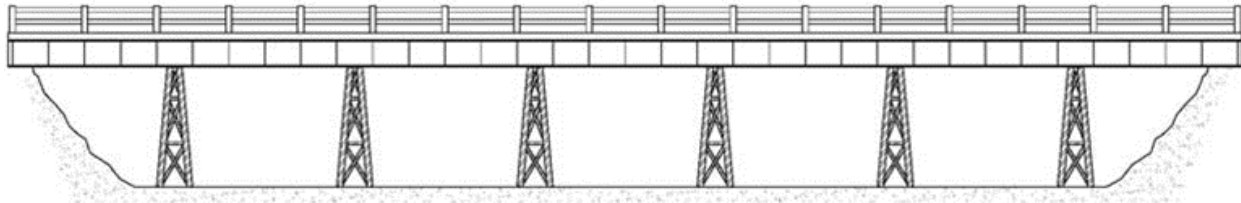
STEEL TRESTLE BRIDGE (DRAWING PROVIDED BY MKE ASSOCIATES LLC, 2013).
